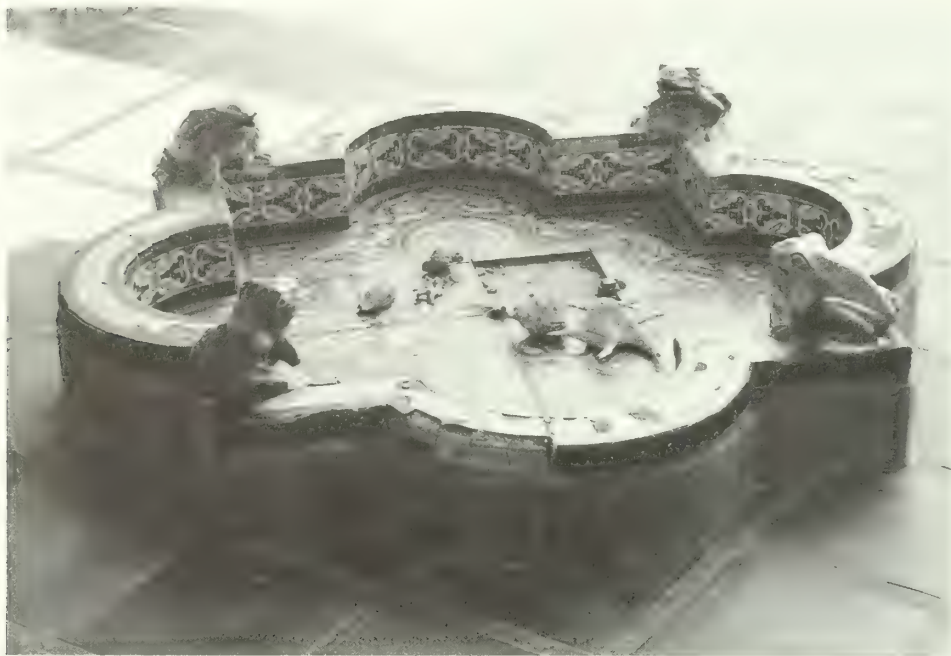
Lanai fountain. Tilework and plumbing is very deteriorated. Center ceramic element is in artifact collection. Photo by R.L. Carper, June 1990.
